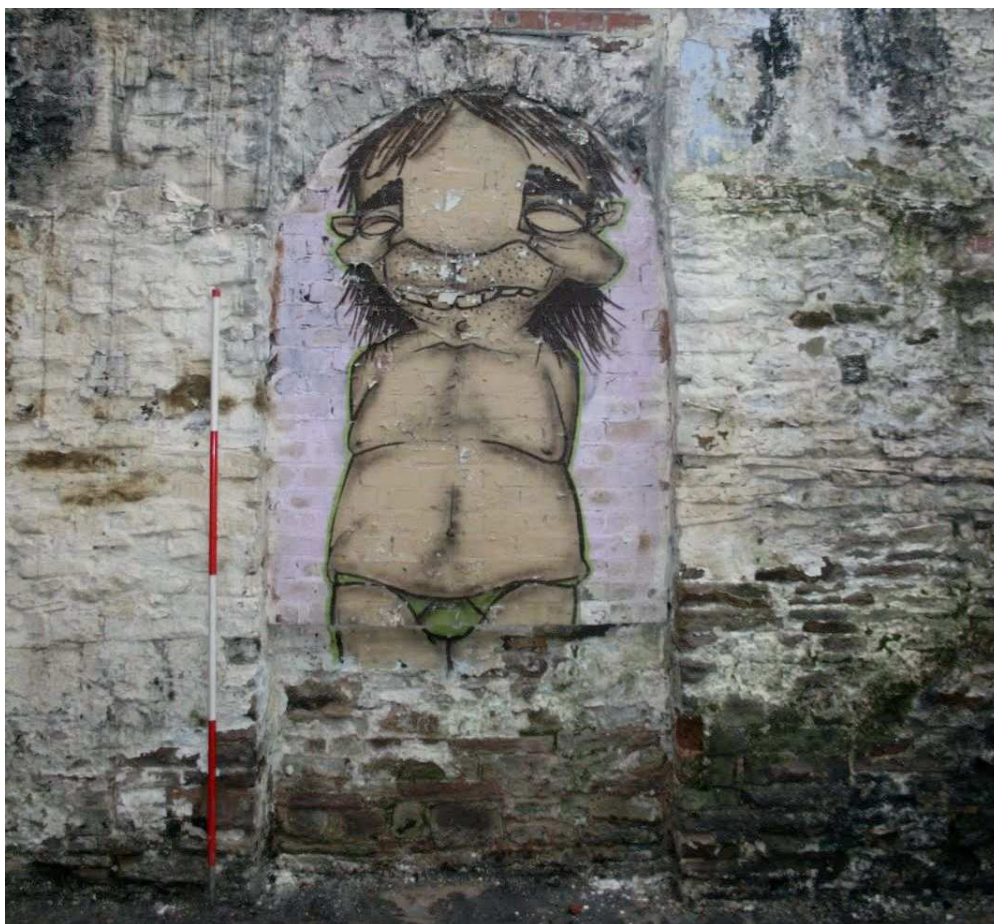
Blocked doorway, south elevation, Bay 11, Building I
